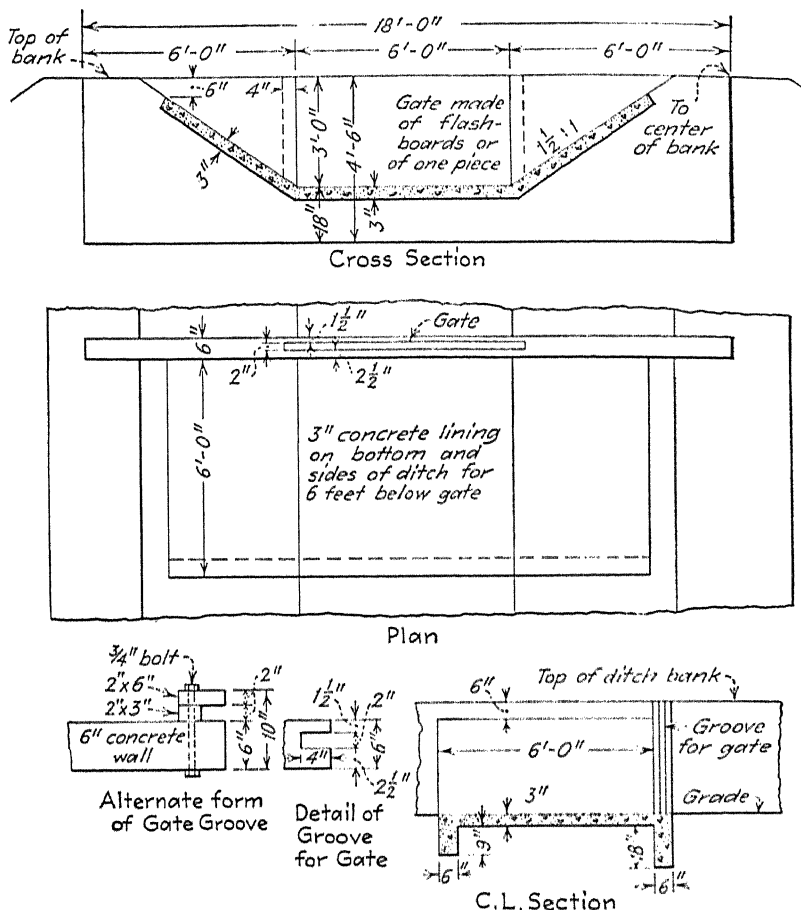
Concrete check gate with cross wall and lining for 6-ft. ditch.
